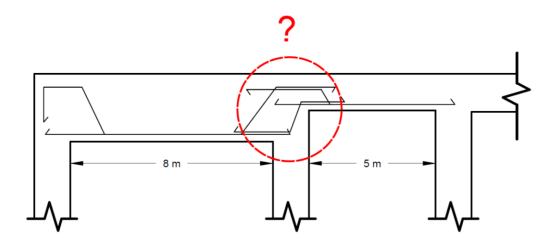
Non-Uniform Span and Cross-Section of a Beam (Ozmen and Unay, 2007)
